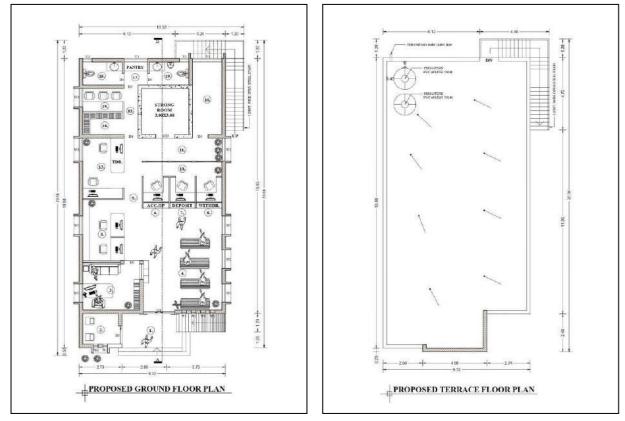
Ground Floor Plan of BankFigure 8.1.5.3 First Floor Plan of Bank
